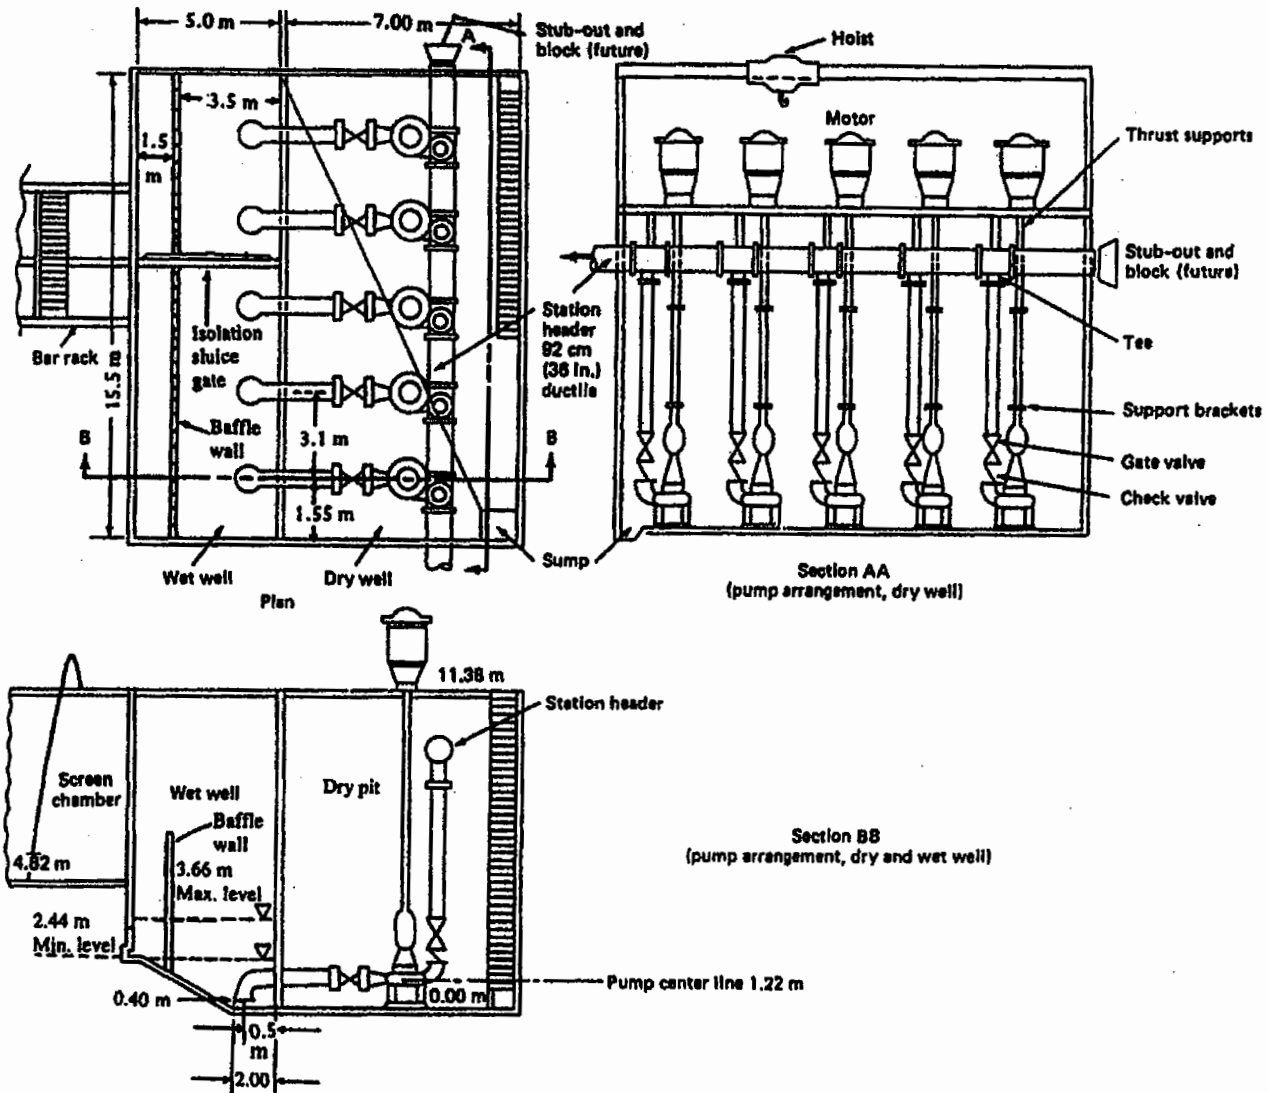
Layout of the Pumps and Piping Arrangements. All Elevations Are with Respect to Assumed Datum at Floor of the Dry Well or Wet Well.
